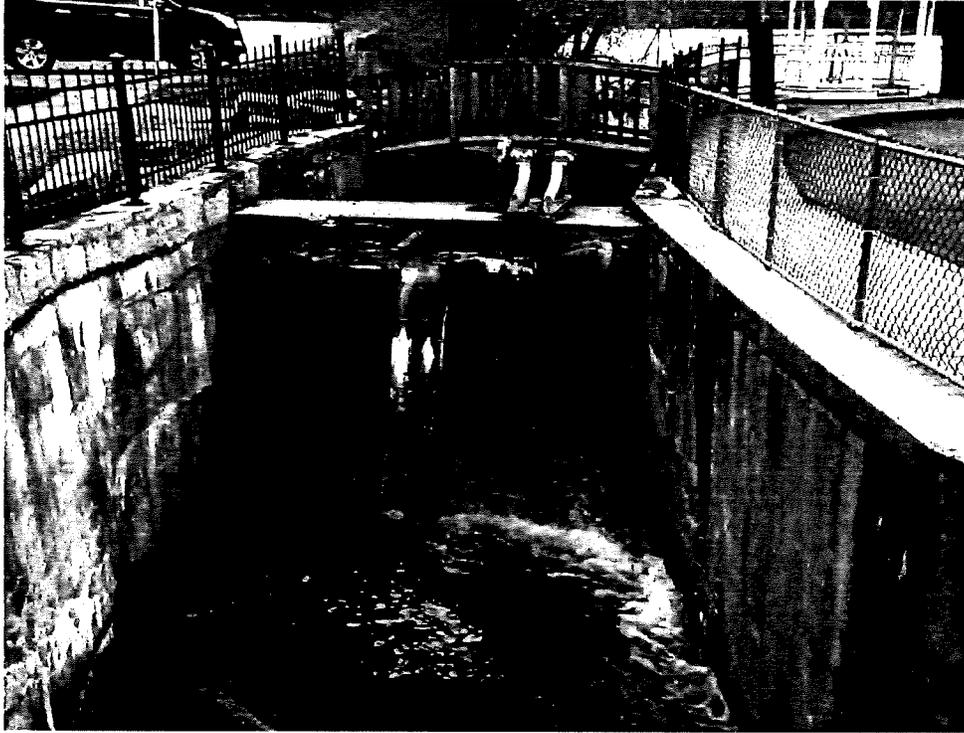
Falkner Street Bridge Viewed from Right Abutment
